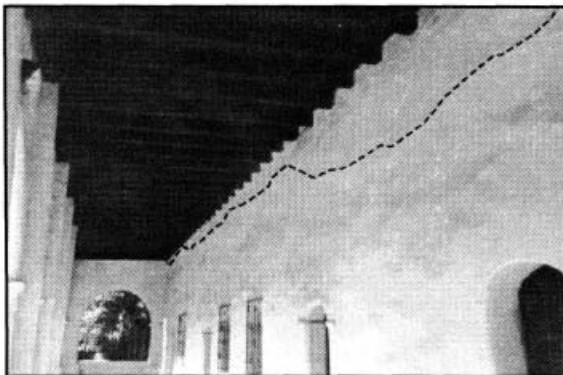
Horizontal cracking in the upper section of the adobe wall along the colonnade of the convento at the San Fernando Mission. This crack extends approximately two-thirds of the length of the building (dotted line follows crack). Out-of-plane rocking is indicated by this crack, the horizontal crack in the wall on the opposite side of the building (Figure 12.3), and a crack along the base of this wall.
